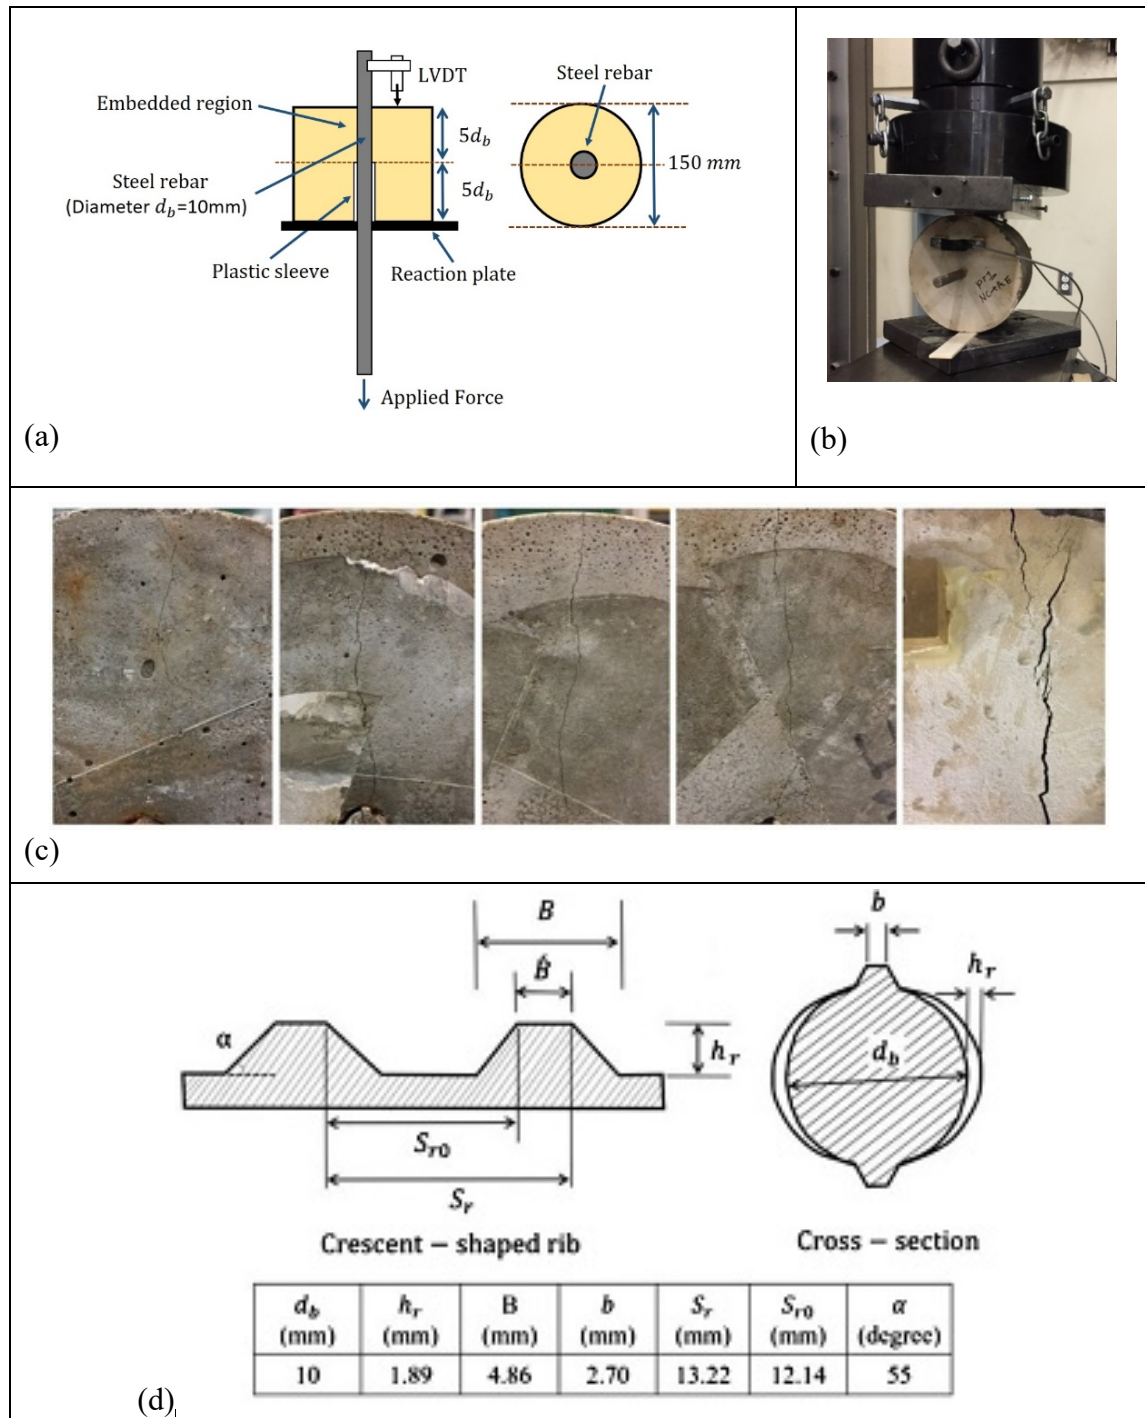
Test set-up: (a) specimen dimensions and pull-out test setup; (b) pre-cracking test; (c) pre-cracked specimens; (d) rebar geometry
